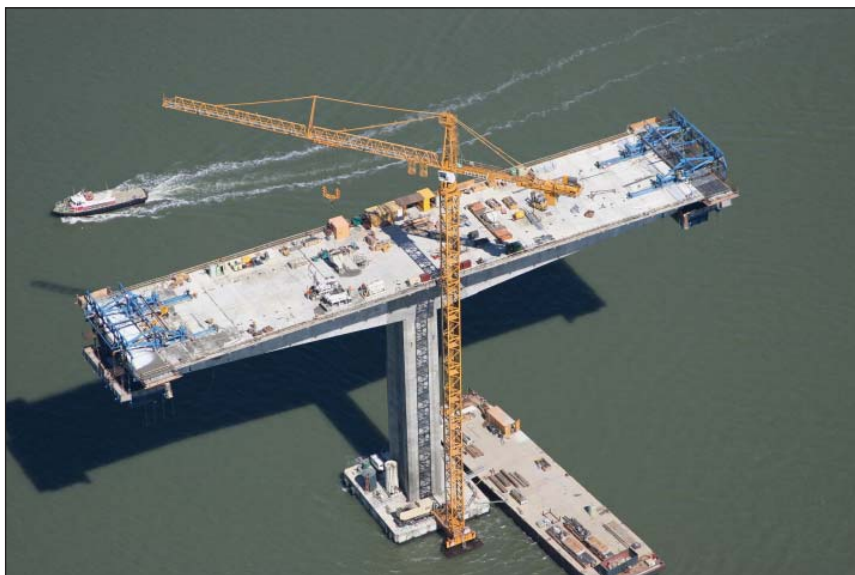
Tower Cranes (yellow) will be placed on the pier cap to service the bridge construction. Traveler system (blue) is specialized form support systems used when doing repetitive work in a linear fashion (PMLR Bridge Deck).
